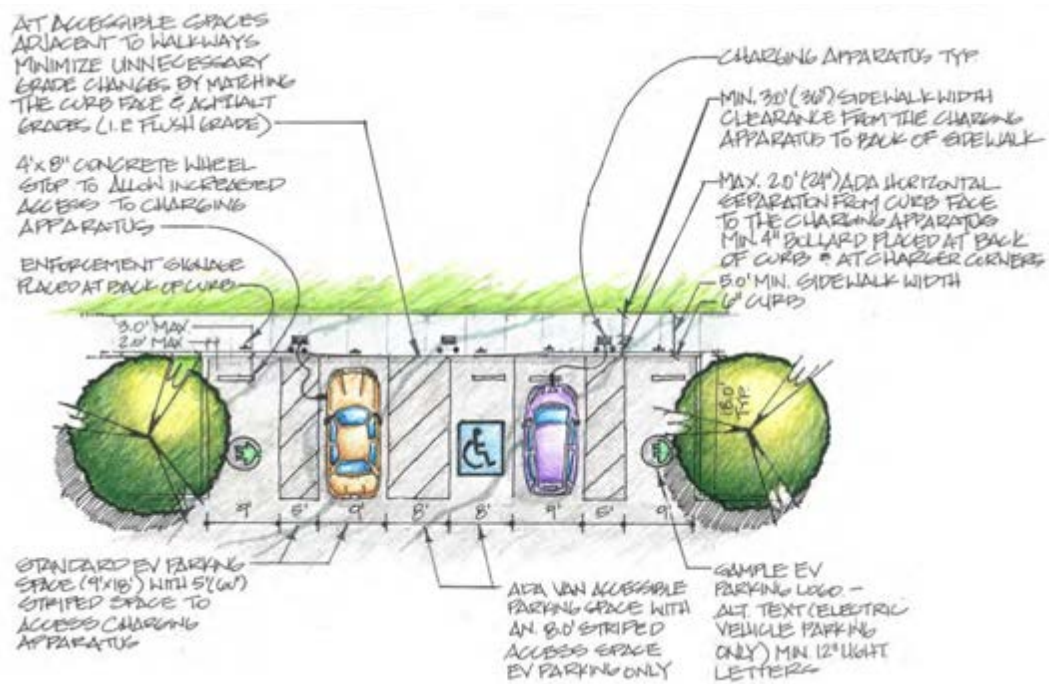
Example of 90-Degree EV Parking Adjacent to Sidewalk
